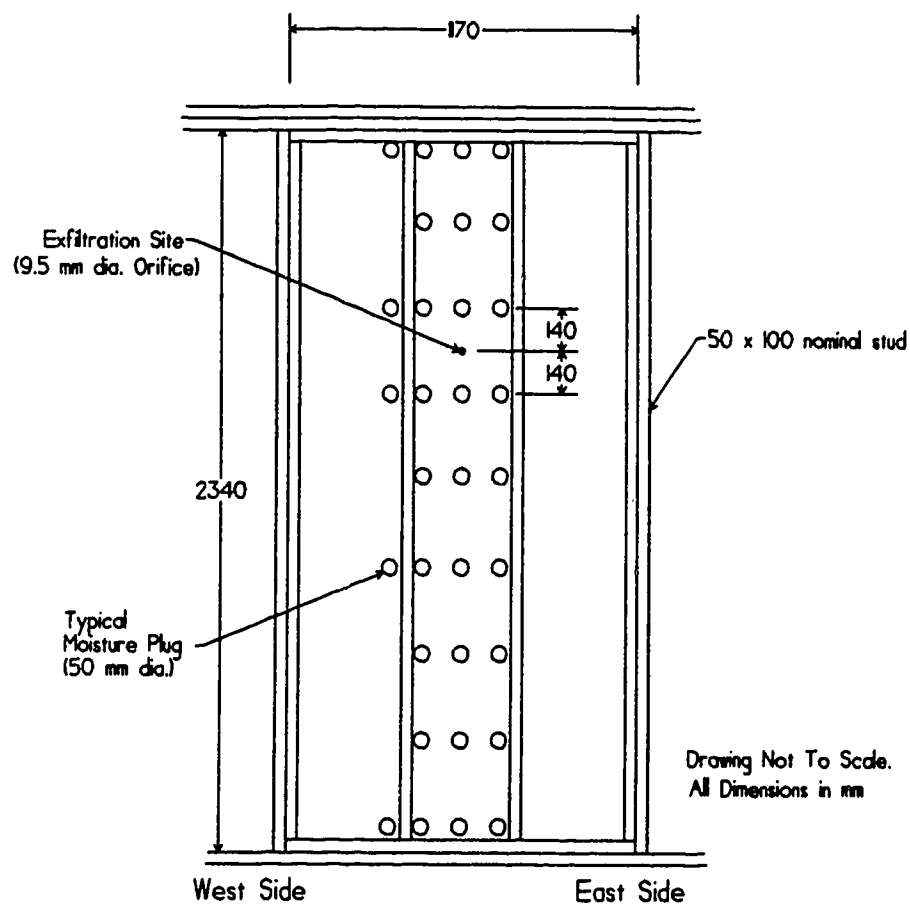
Front view of the north wall test panel showing construction details, placement of the moisture plugs, and the location of the exfiltration site.
